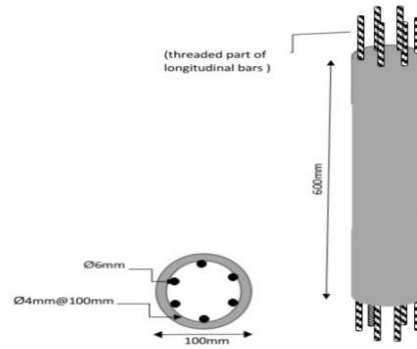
Dimensions and reinforcement details of RC columns, showing the layout of longitudinal and transverse reinforcement.
